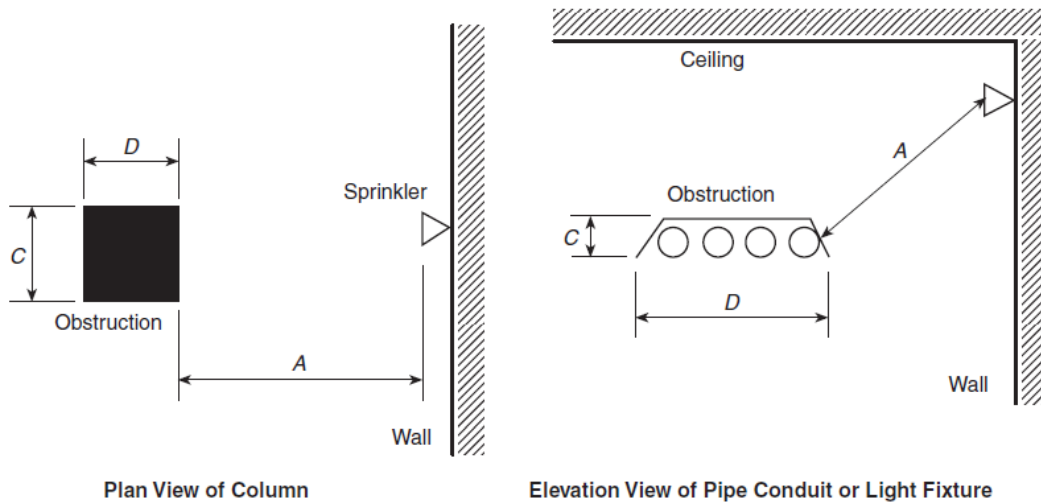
Permitted Obstruction on Wall Opposite Sidewall Sprinkler.
